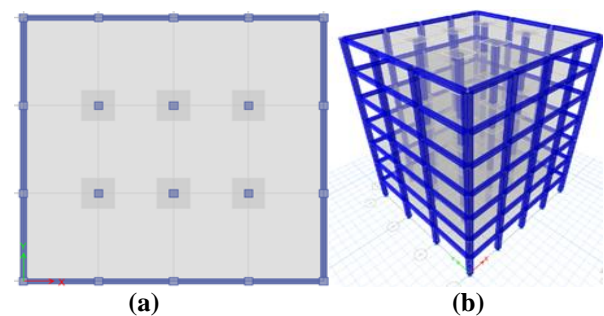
(a) Plan and (b) 3D view of bare frame building.
